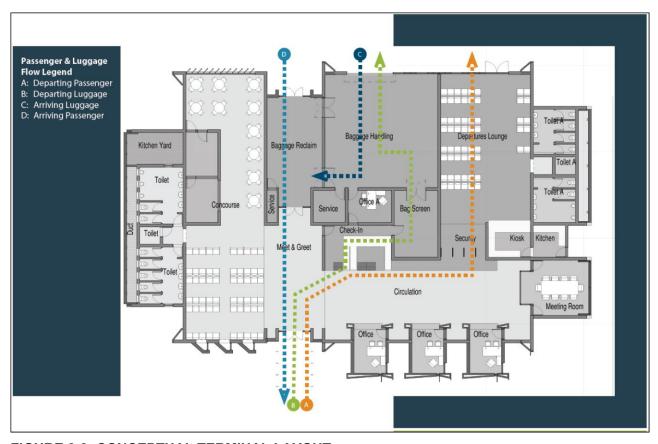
CONCEPTUAL TERMINAL LAYOUT
